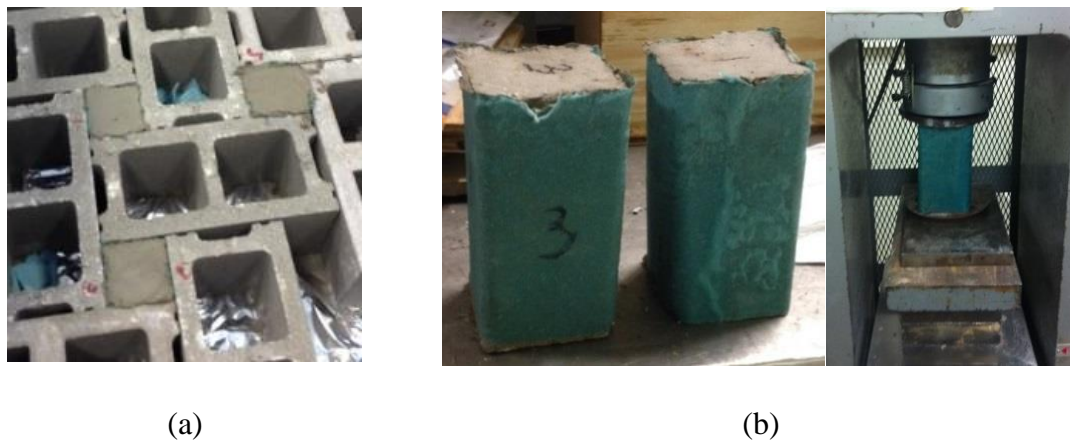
Grout specimens. (a) casting and (b) samples and testing.
